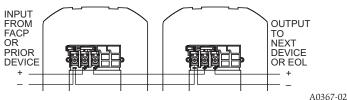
WIRING TERMINALS, SHORTING SPRING, AND STRIP GUIDE
